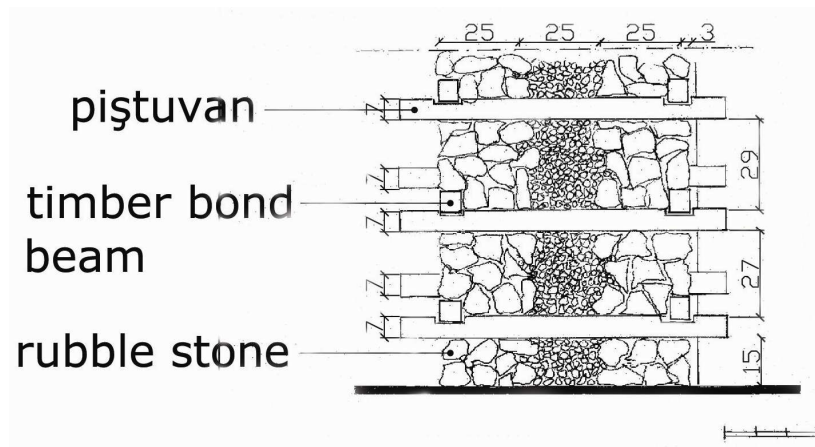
7 Drawing of the wall type 2. Çelik 2008.
